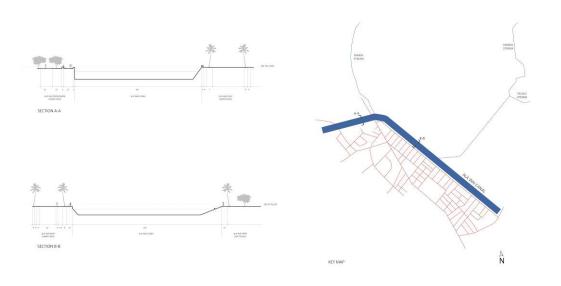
Existing Section Ala Wai Canal (Source: Author, Justin Manongdo)
